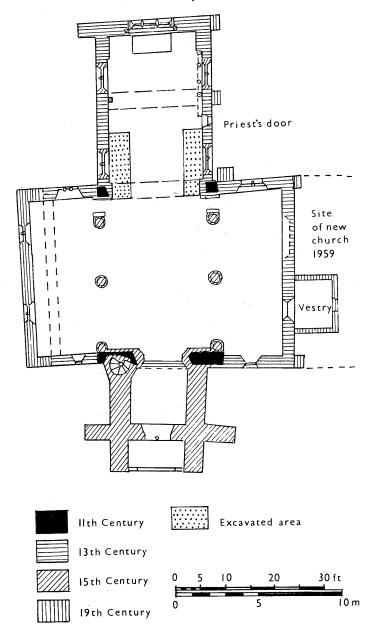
Plan of St John's Church Coulsdon, based on the *Victoria County History
